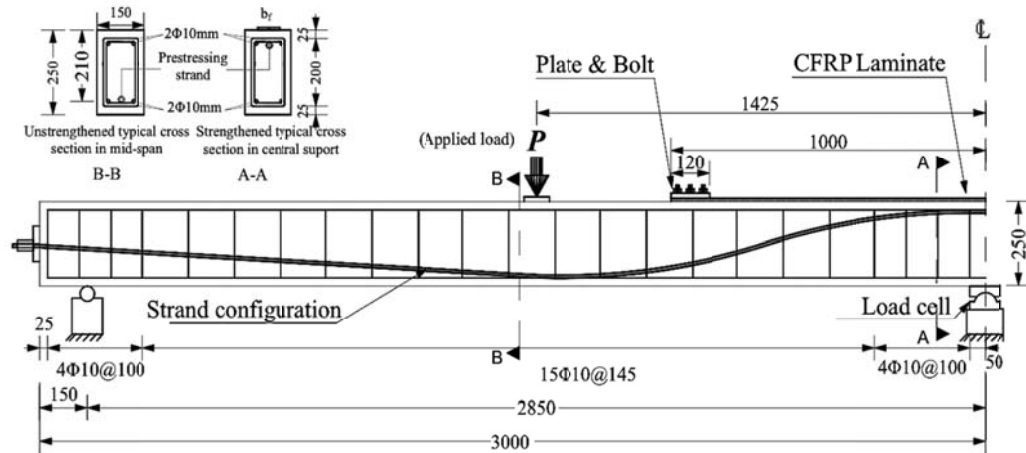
Geometrical dimensions, Test set-up, Longitudinal profile, Typical cross section of beam in sagging and hogging region, End anchorage and reinforcement of test specimens (all dimensions in mm)
